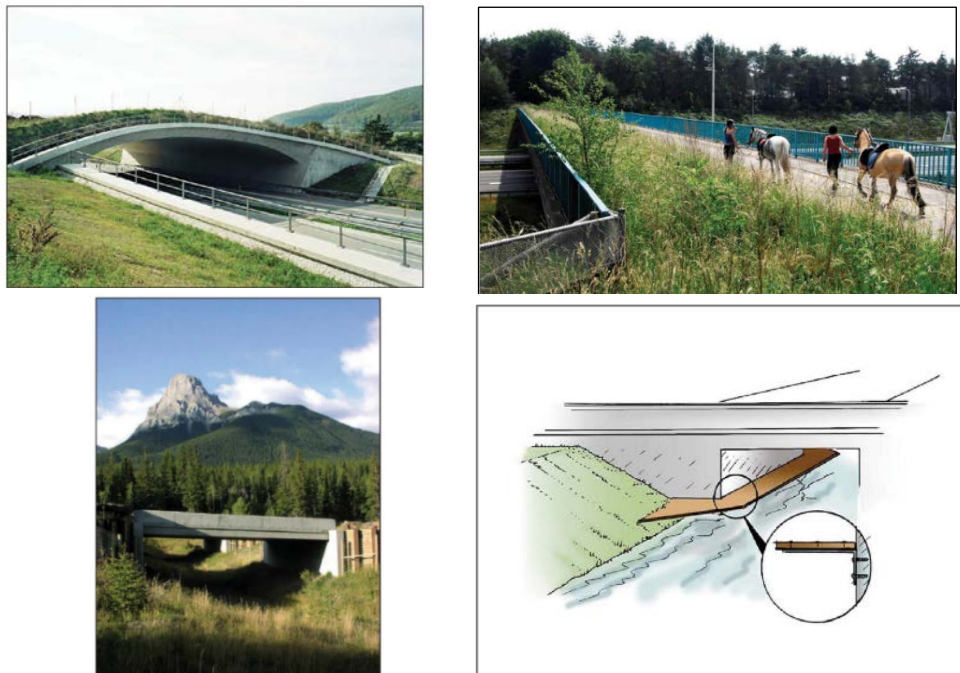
Examples of wildlife crossings (clockwise from top left): landscape bridge, multiuse overpass, modified culvert, and large mammal underpass. (Source: Clevenger and Huijser 2011)
